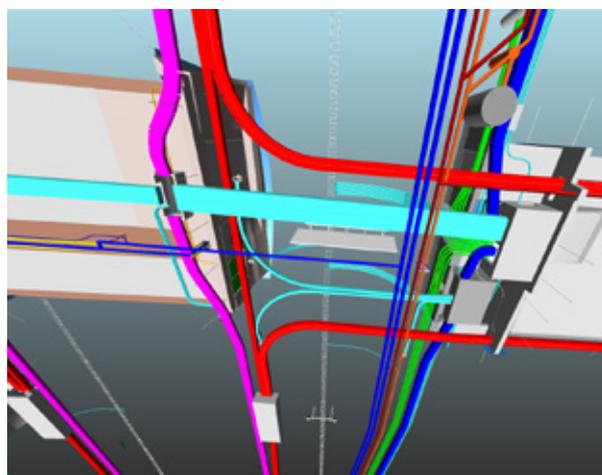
Example of a standard crossing with conduits and pipes at a technical building.
